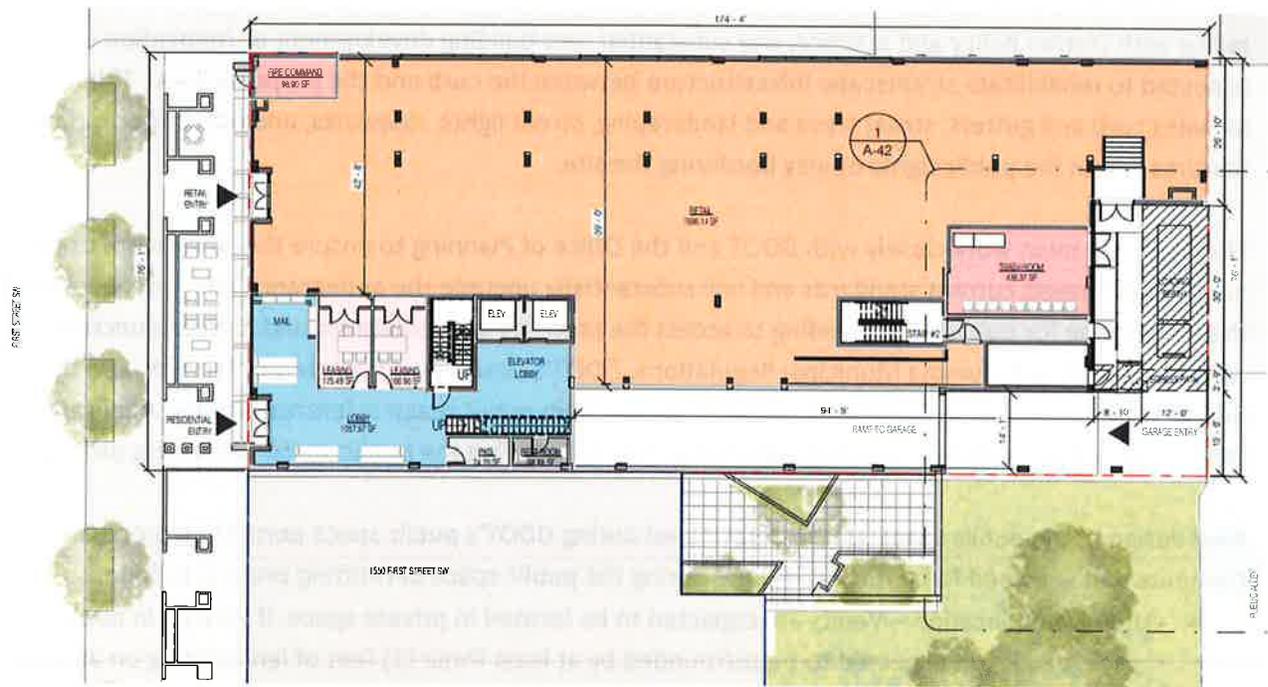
Site Plan (Source: Applicant's Statement in Support)
